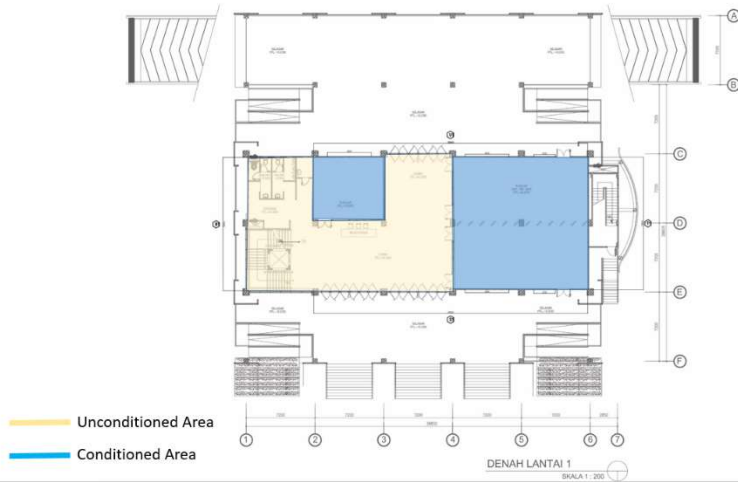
Floor Plan 1 Building B Faculty of Biology UGM.
